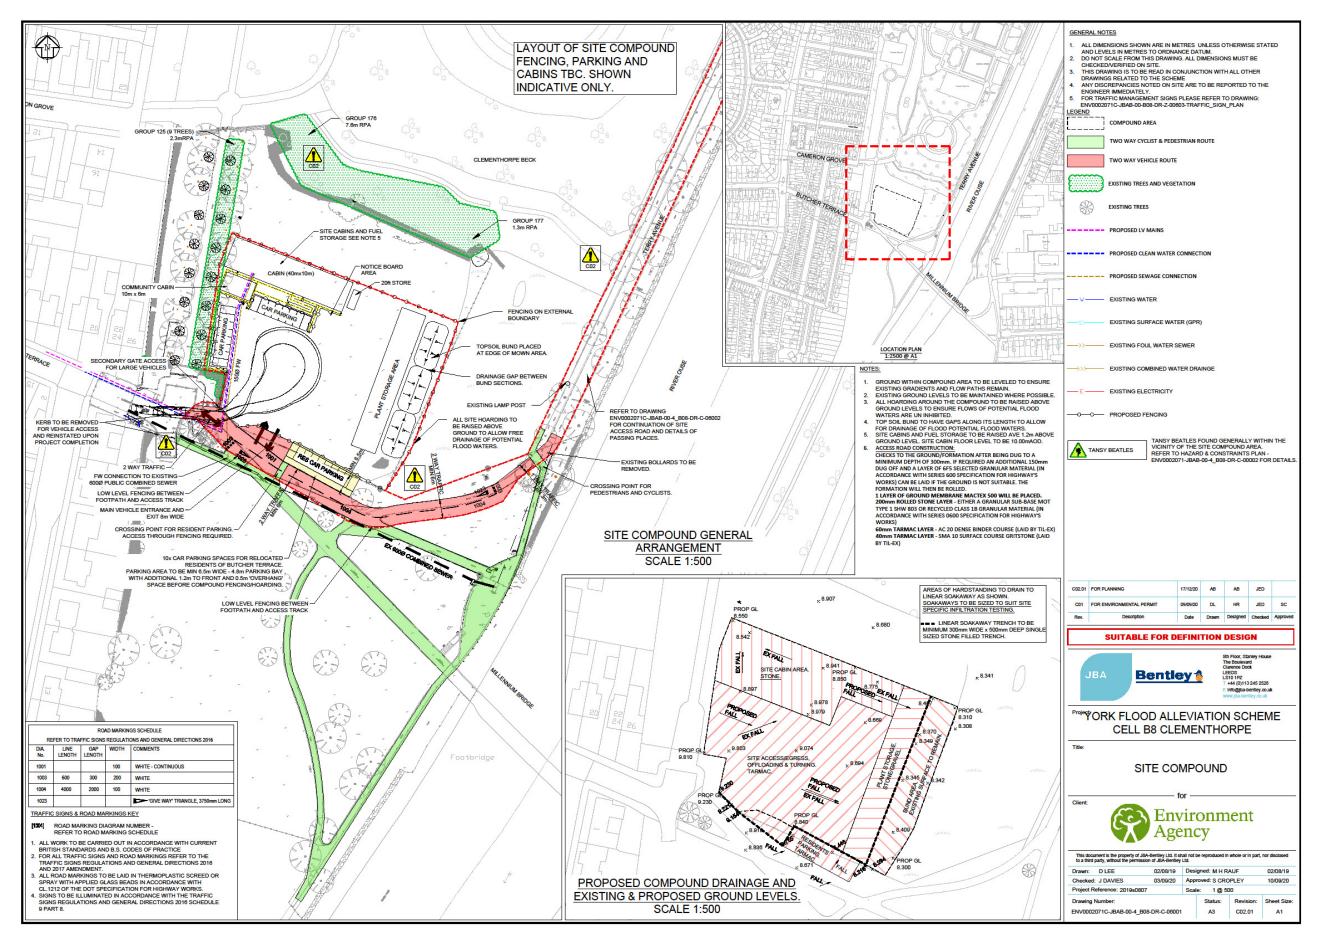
Plan of site compound. Red area = vehicular routing, Green area = pedestrian & cyclist routing.
